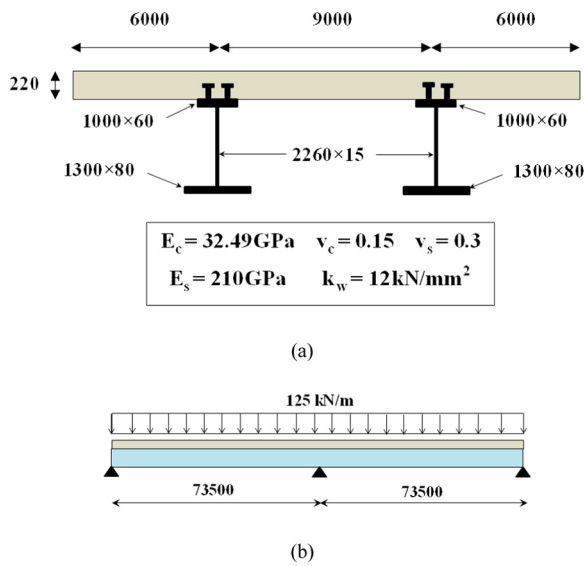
Two-span twin-girder composite deck: (a) cross-section dimensions and material properties, (b) boundary and loading conditions (all dimensions in mm).
